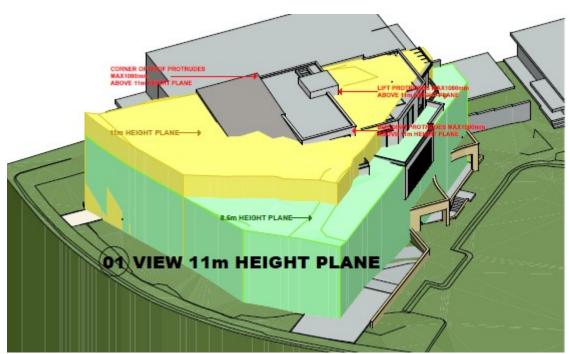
(above): Approved building height diagram with breaching elements shown in grey (noting that neighbouring buildings are also shown)
